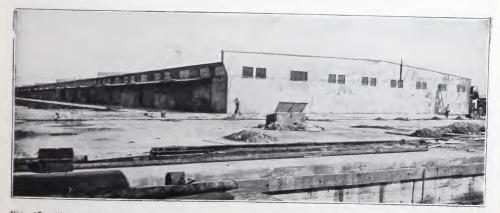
Six miles of Gunite Walls on warehouses and piers at Army Supply Base. Norfolk, Va. Placed by Cement Gun Construction Co. of Chicago, using Style 26A Triangle Mesh Reinforcement.
